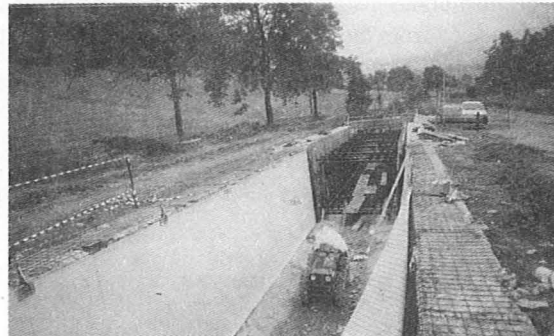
Ribbed PVC membrane positioned before embedment in new concrete walls
